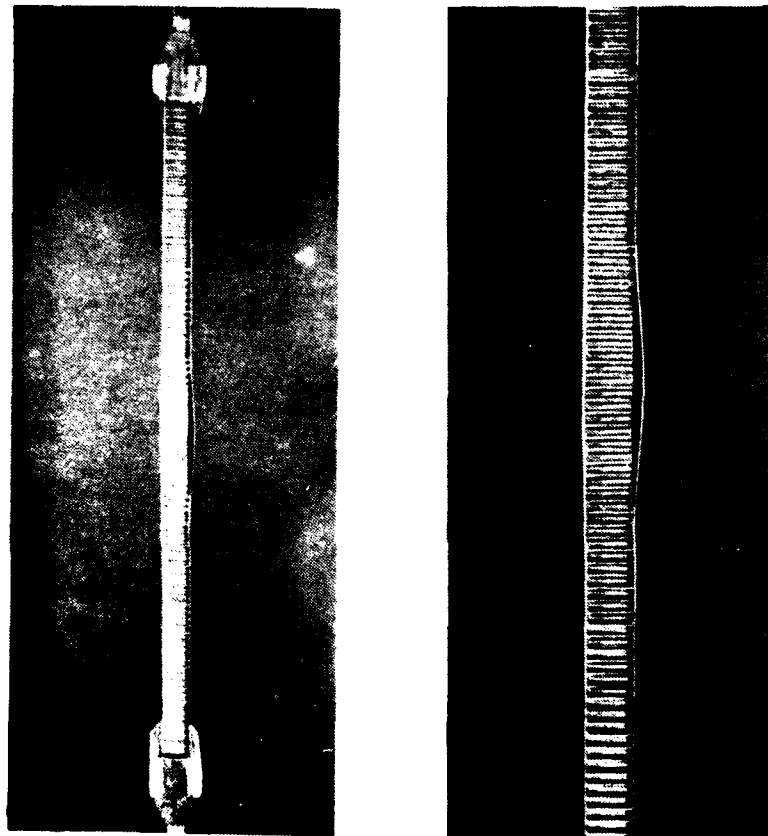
BUCKLING FAILURE OF SPECIMEN TEN
